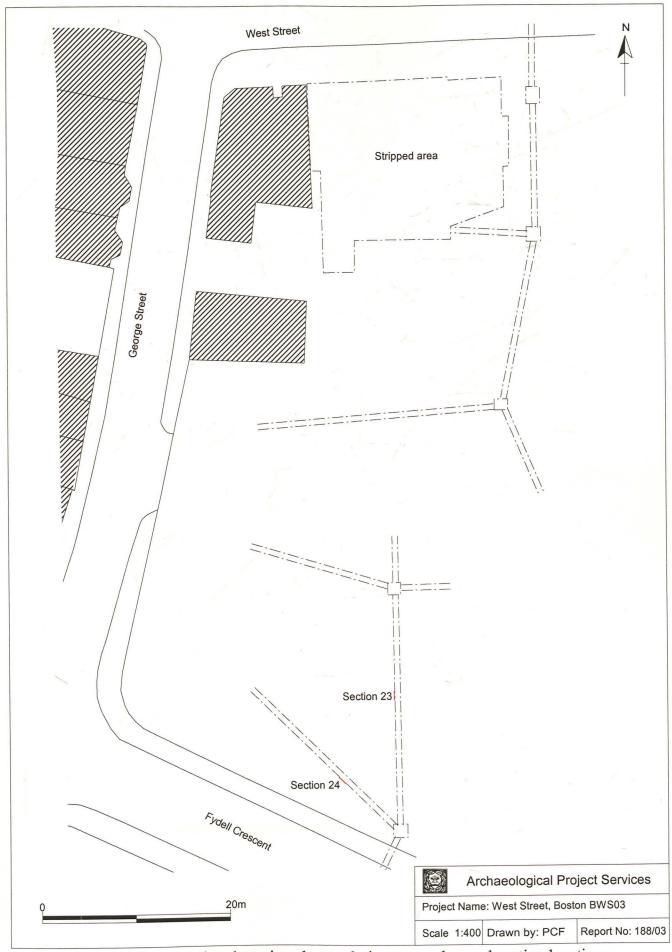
Plan showing the stripped area, drainage trenches and section locations
